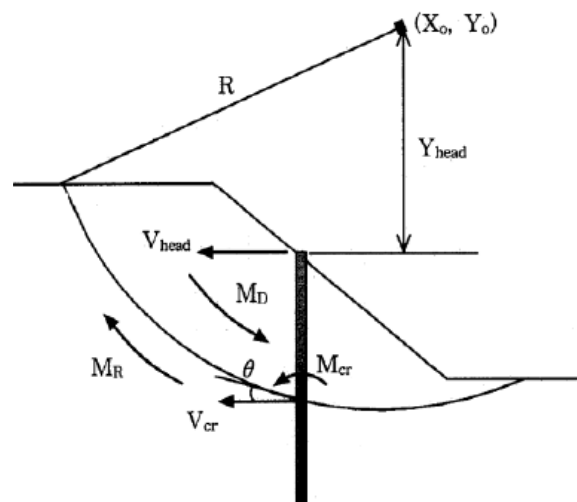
Forces on stabilizing piles and slope (Jeong et al., 2003)
